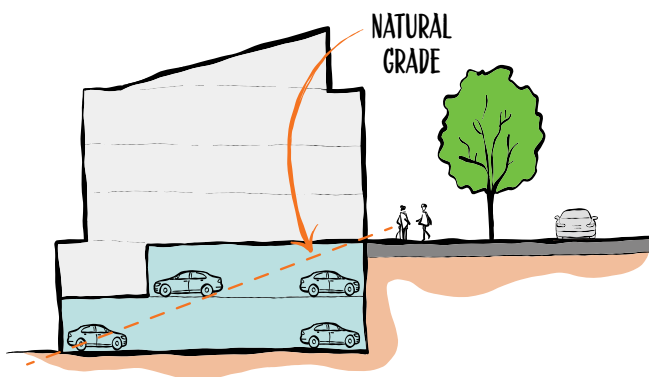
Design buildings to adapt to up-slope and down-slope conditions relative to the street.
